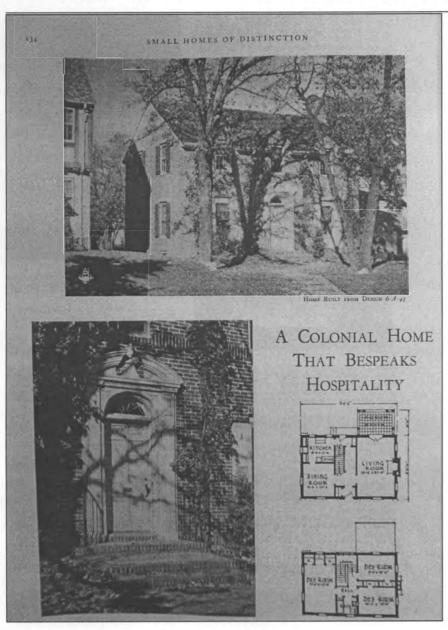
Image from Jones, ed., *Authentic Small Houses of the Twenties*, page 134. The exterior of 1927 Wauwatosa Avenue, as well as the floor plan (albeit reversed), matches the subject plan drawn by the Architects' Small House Service Bureau.
